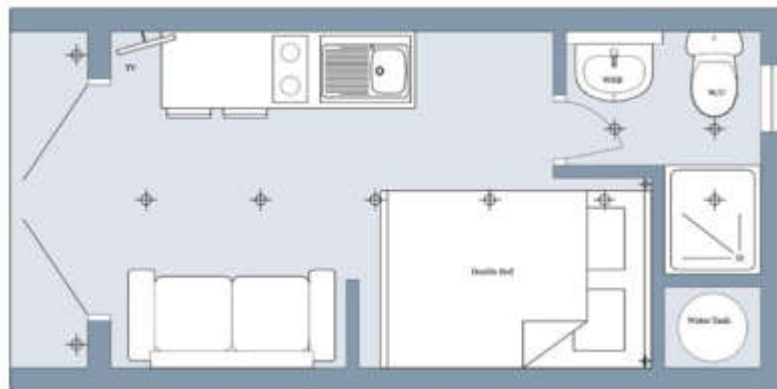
Internal Plan for Glamping Pods and Hobbit Huts
